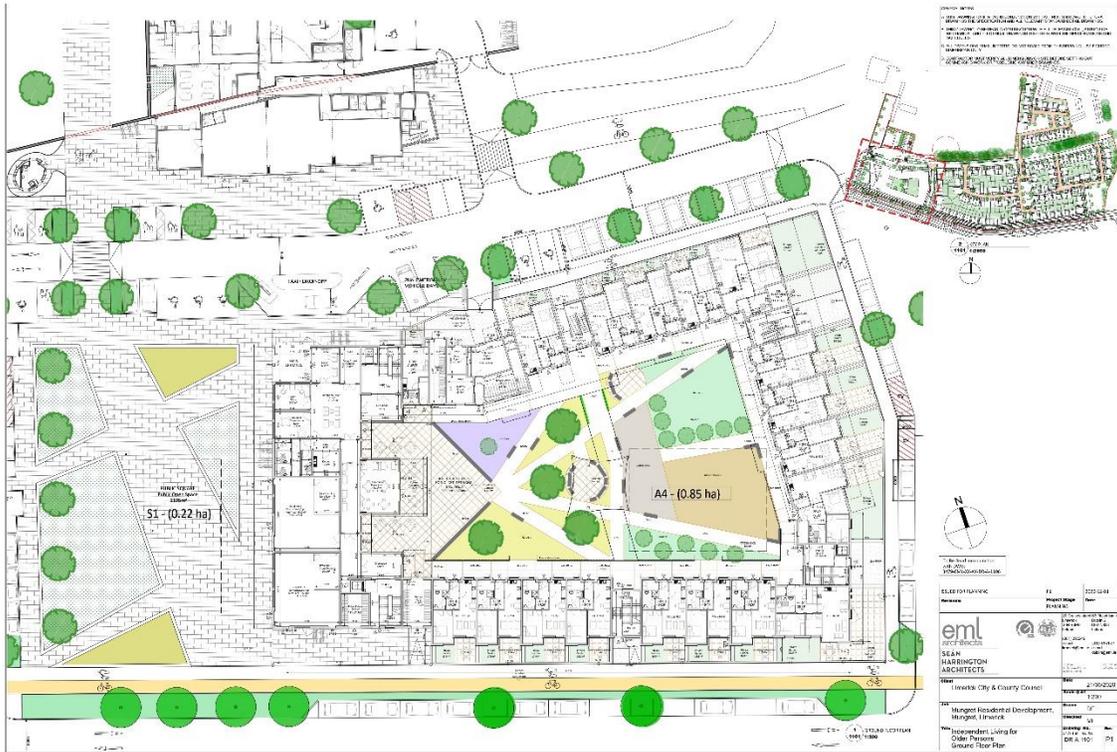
Ground Floor Plan – Independent Living for Older Person
